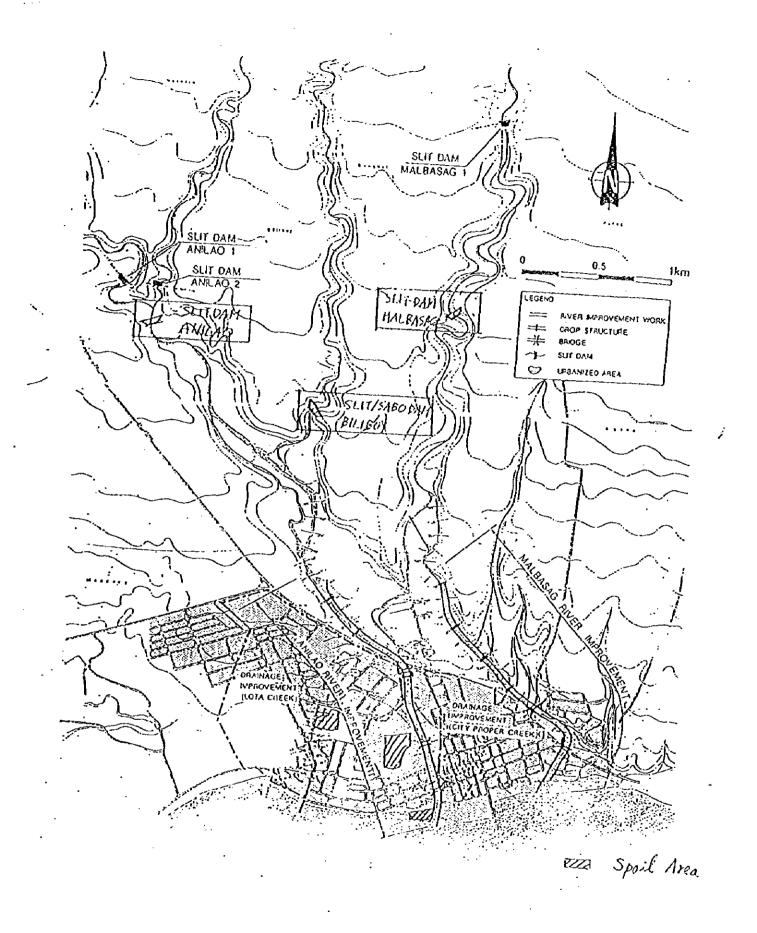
PROPOSED LOCATION OF SLIT DAM SITE AND SPOIL AREA
